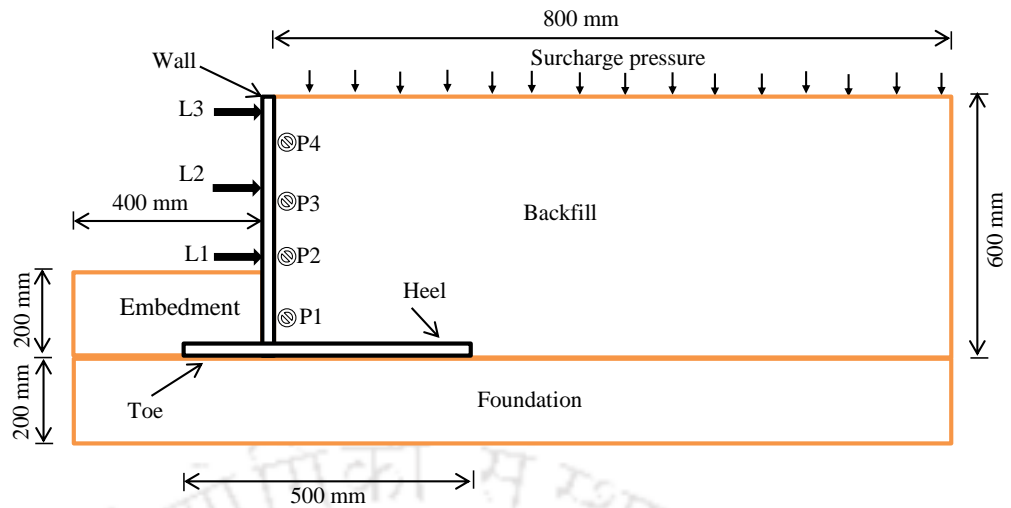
Schematic diagram of cantilever retaining wall model
